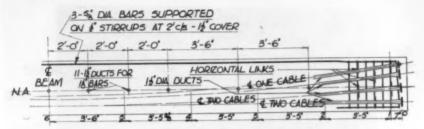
Sectional Elevation at Centre-line of Beam.
